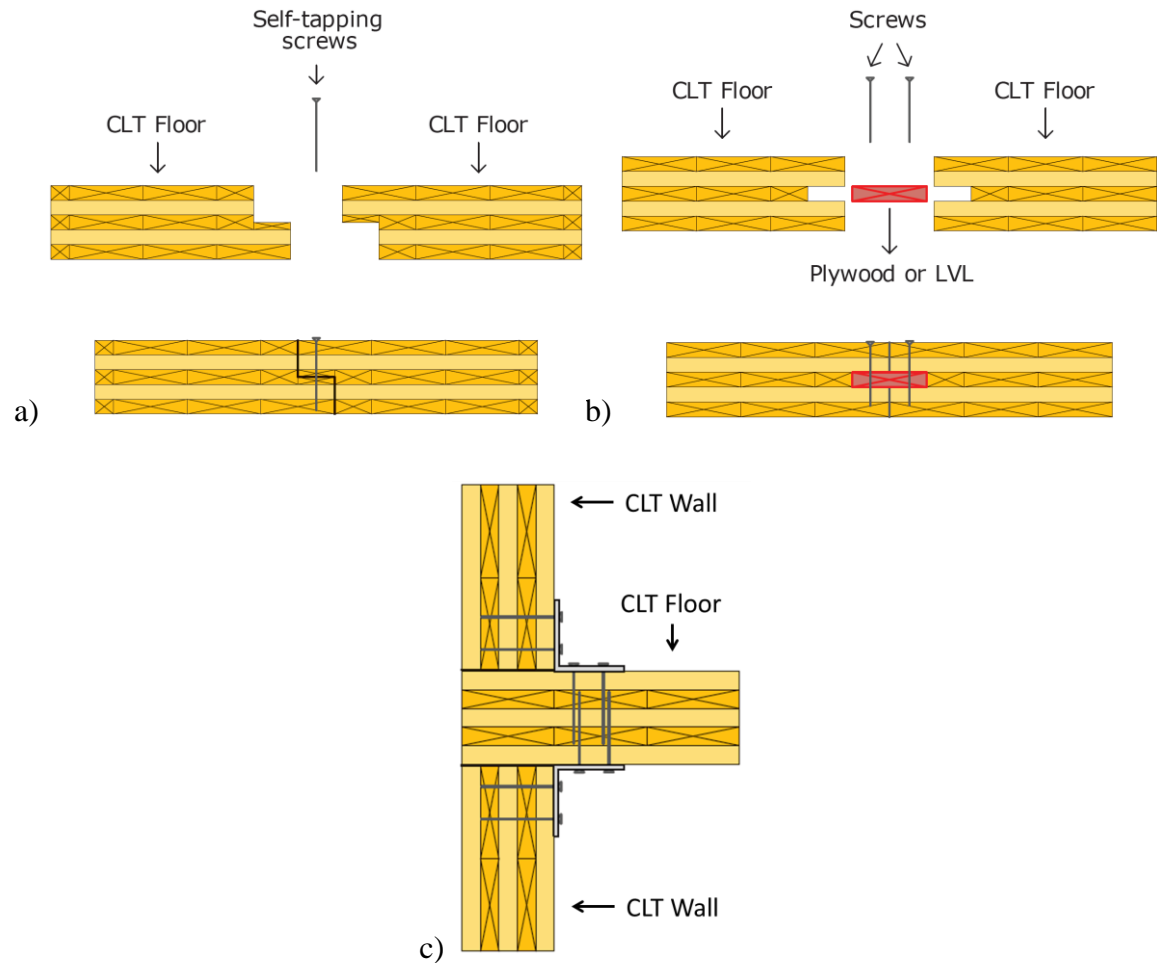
Illustration of screw-type connections for adjacent shear wall panels and the wall-to-floor brackets (FPInnovations, 2011): a) half-tapped joint; b) spline joint; c) Brackets installed at upper or lower side of the floor.
